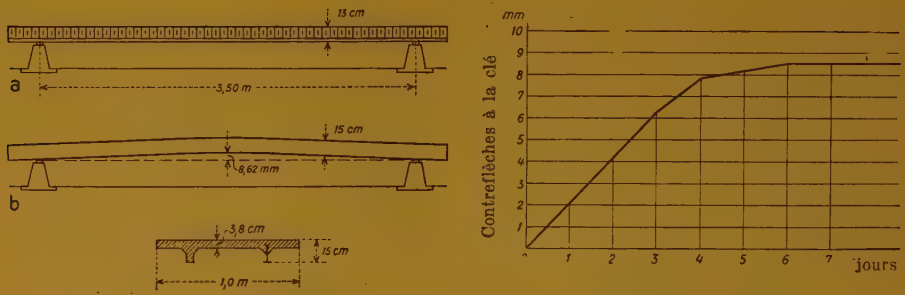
Test with a piece of flooring formed of two Christin metal girders connected by a cross-member in expanding concrete.
